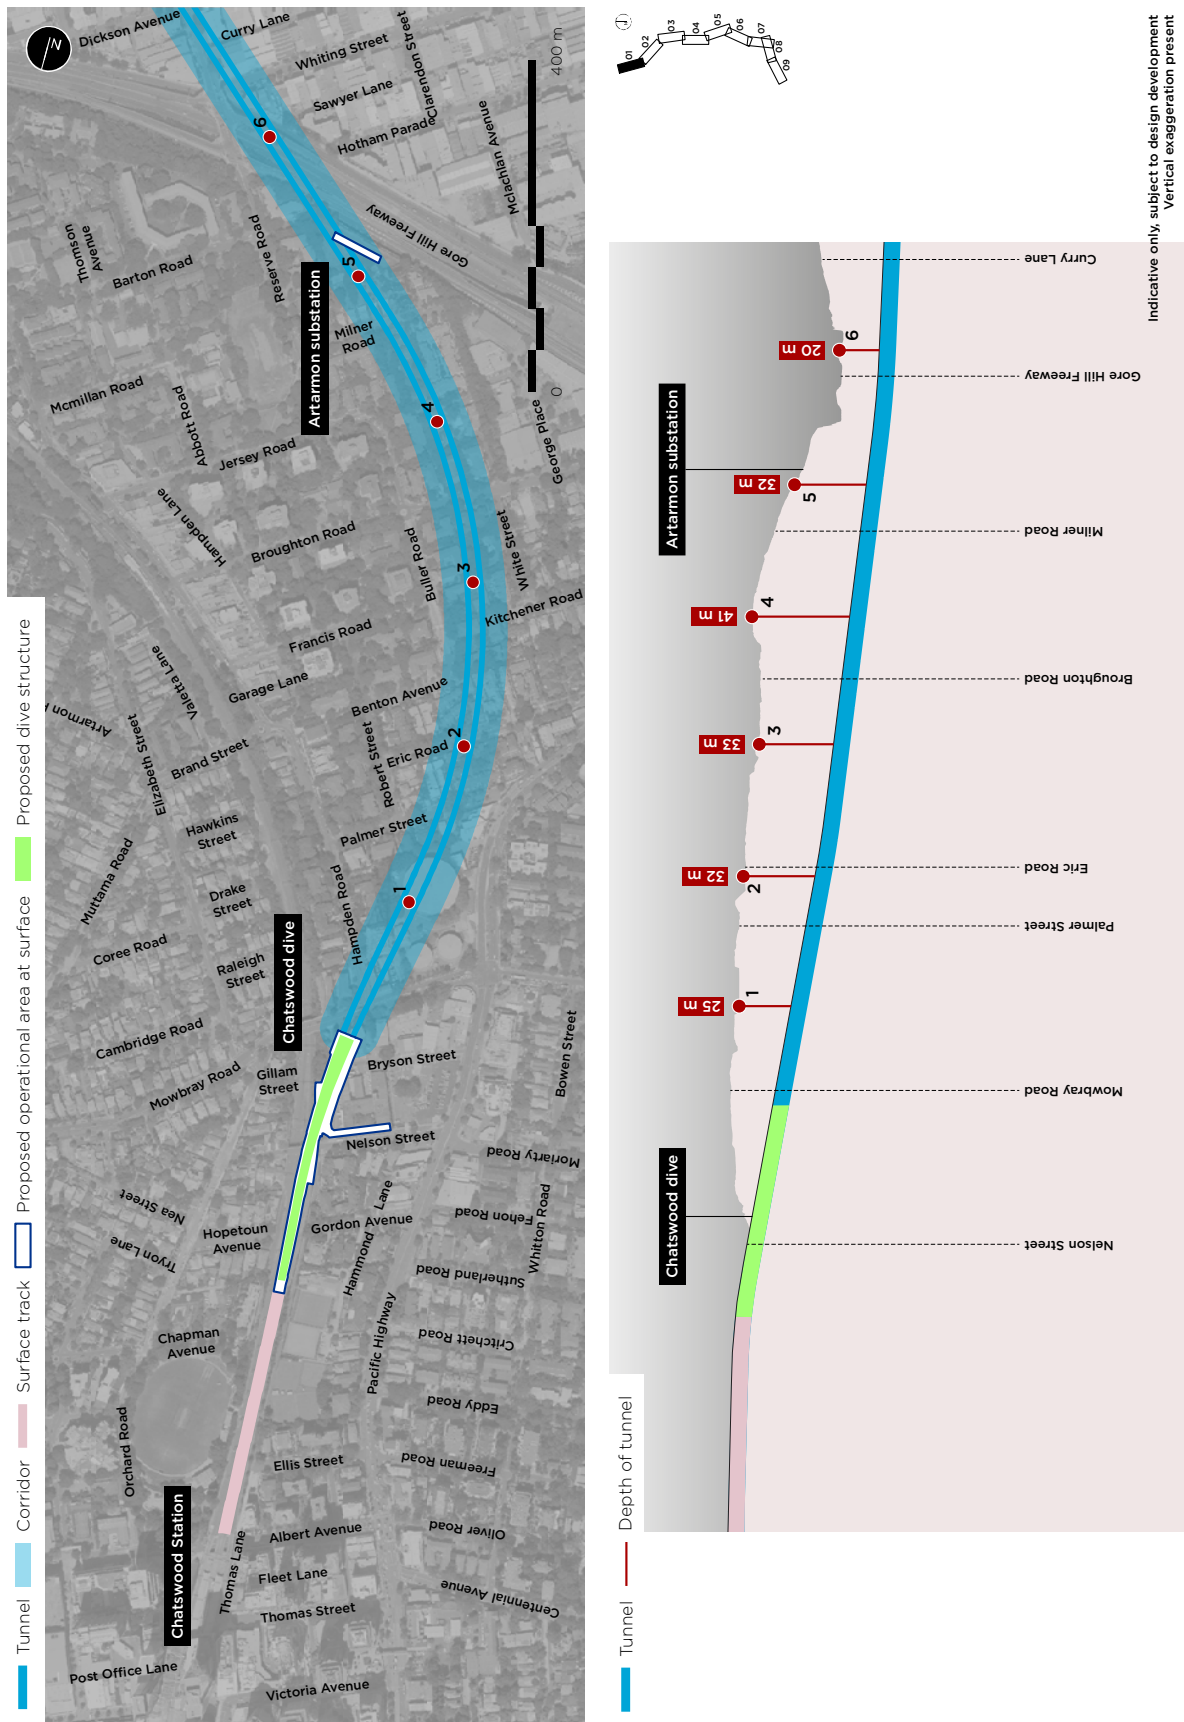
Indicative Chatswood to Sydenham alignment plan and long section
